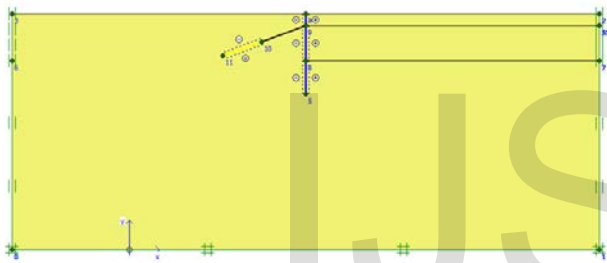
Schematic of Anchored Sheet Pile Wall and Penetration Depths Analyzed
